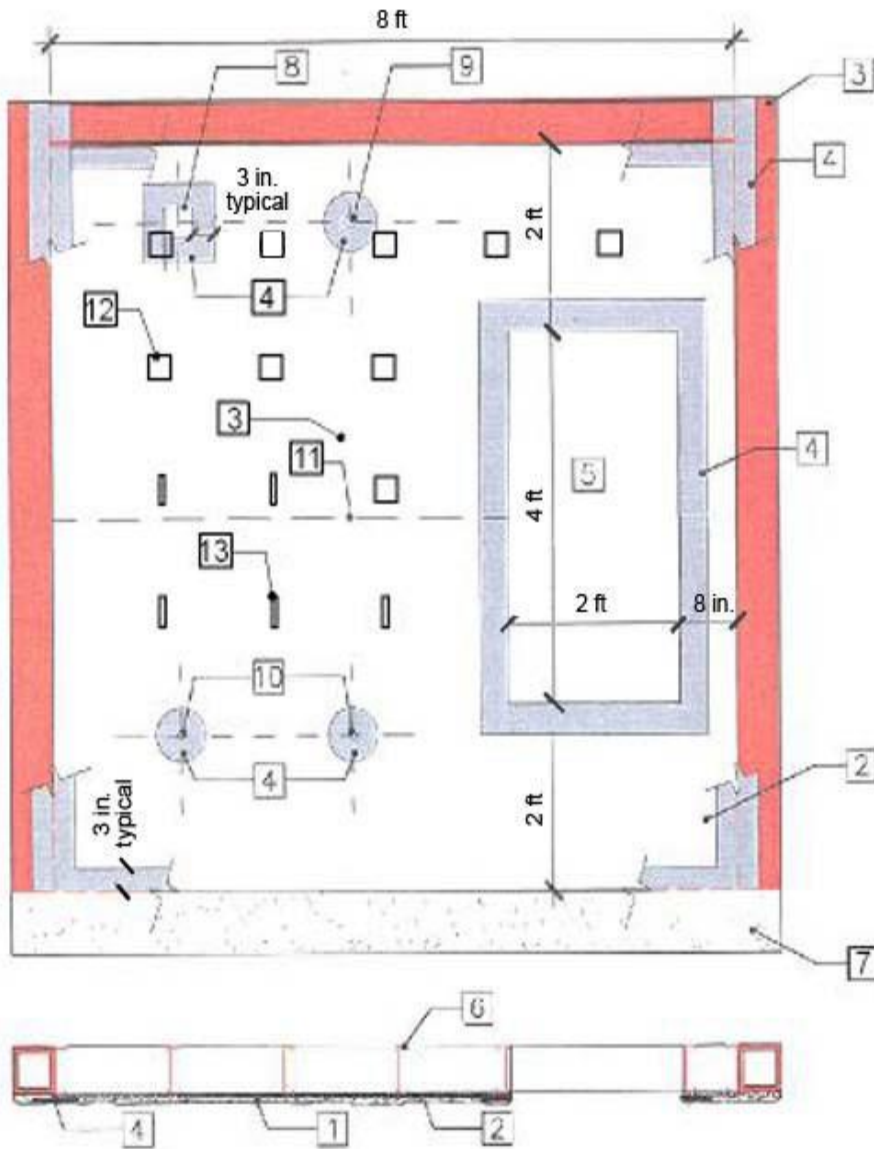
Specimen No. 2: Example of continuity across junctions and penetrations in gypsum and metal stud infill wall and at foundation wall
